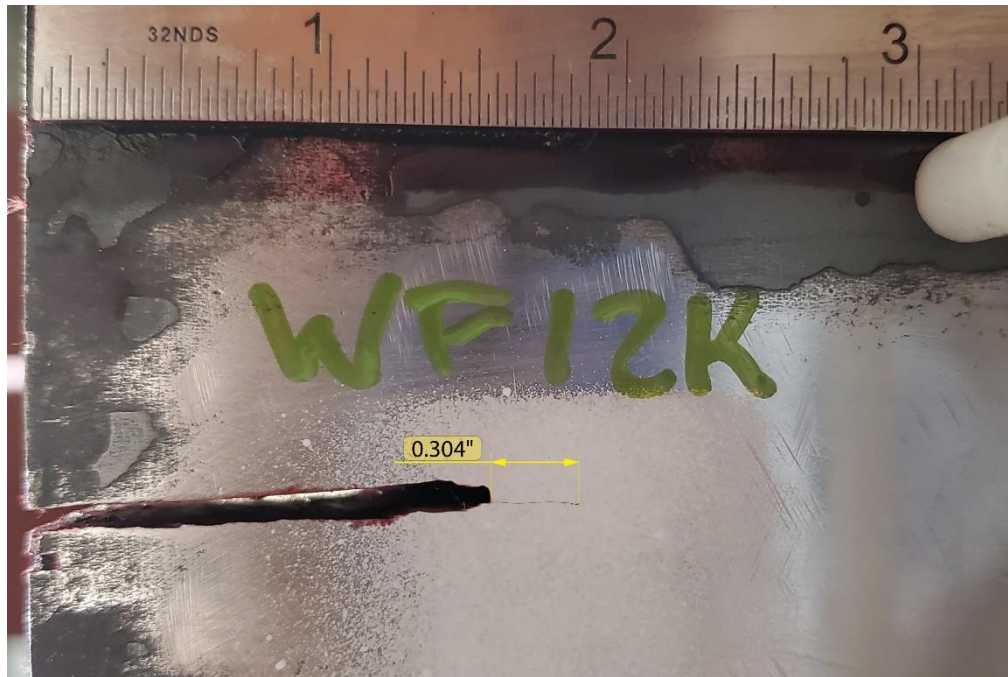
Fatigue crack at the West bottom flange after 12,000 load cycles
